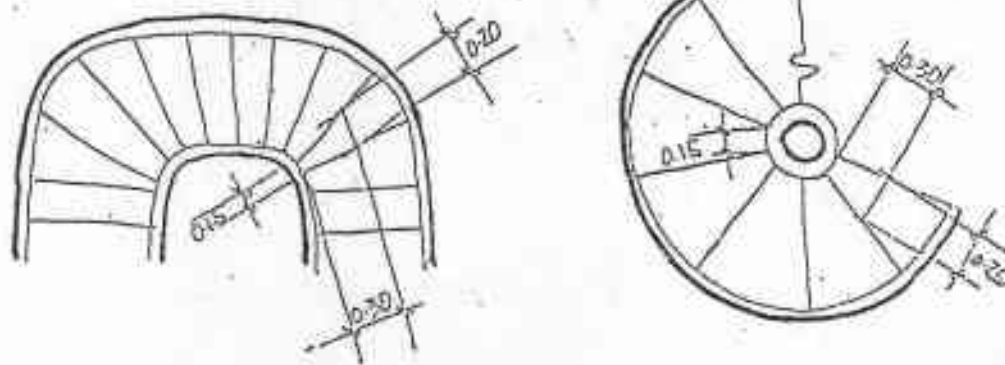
WINDING and CIRCULAR STAIRWAYS
